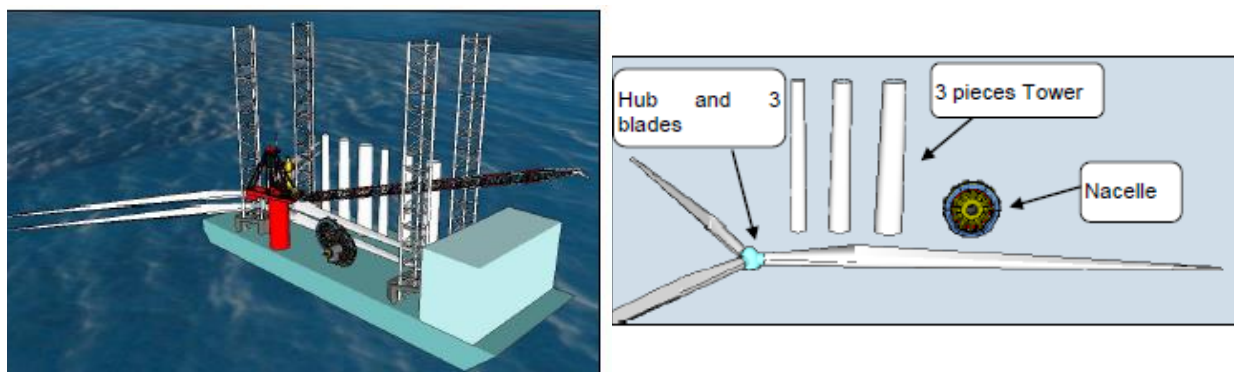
(left) Deck Load on a WTIV with Pre-Assembled rotor configuration (2 WTG in that instance); (right) Assembled rotor, nacelle without hub and tower in three pieces
